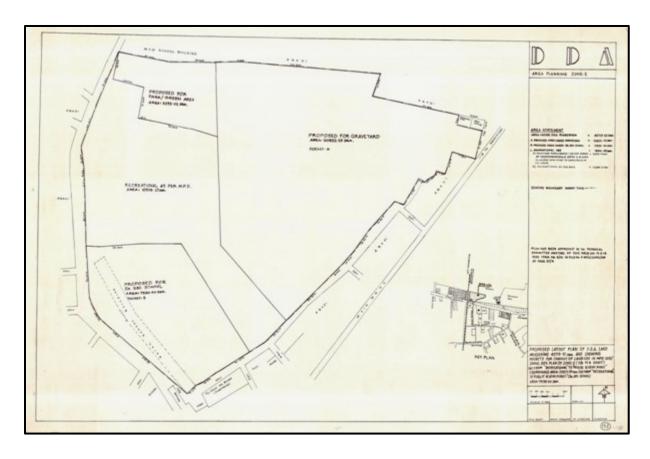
Layout plan for a neighborhood park development. Source: DDA Layout Plans.
